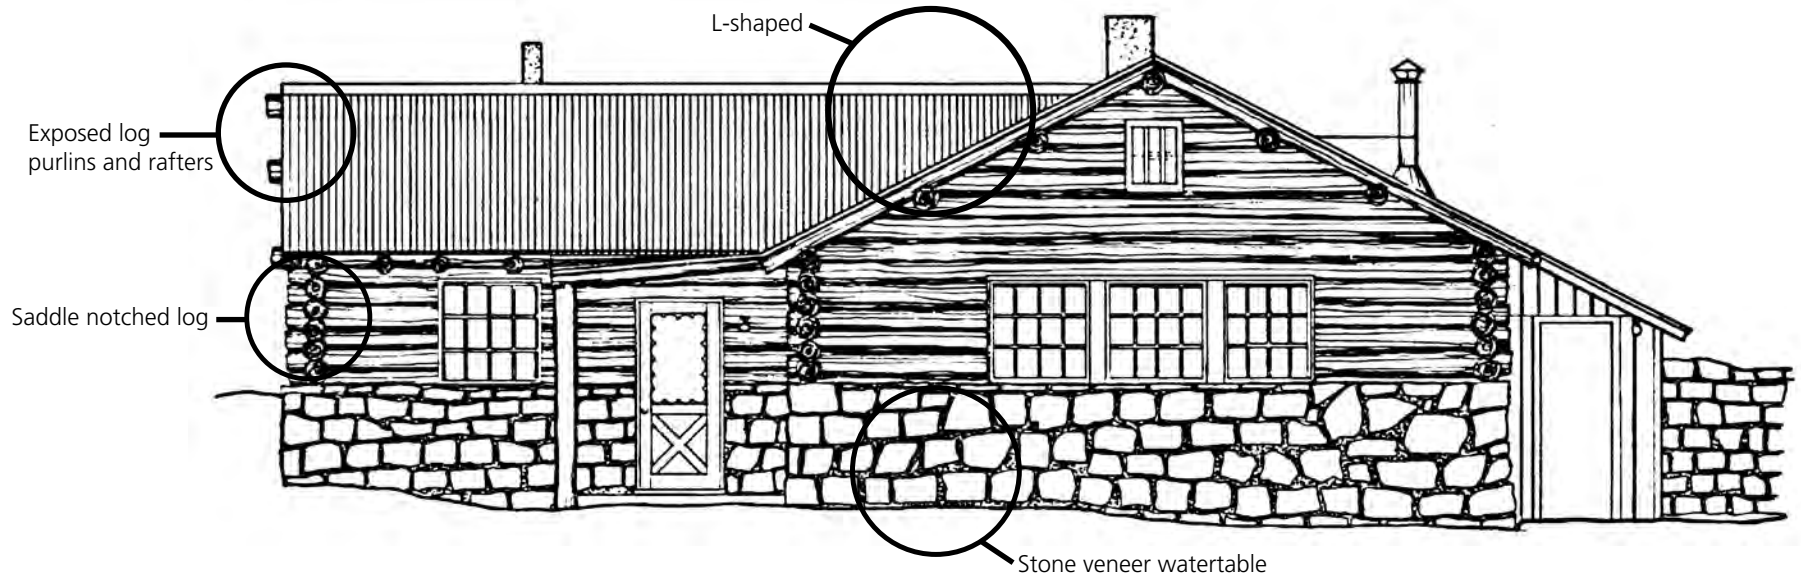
Building 111, South Elevation, Historic American Building Survey, National Park Service, W. Vandeventer and Dave Snow, 1986 (NPS Alaska Regional Office Files)
